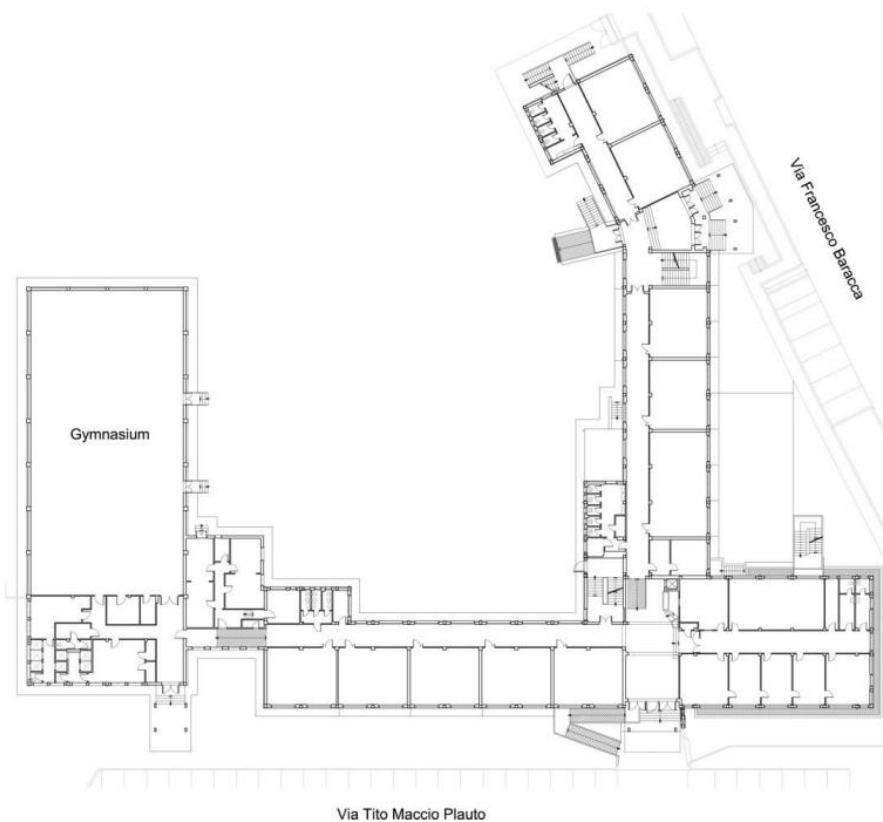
School ground floor (North up) (Zinzi et al., 2014)
